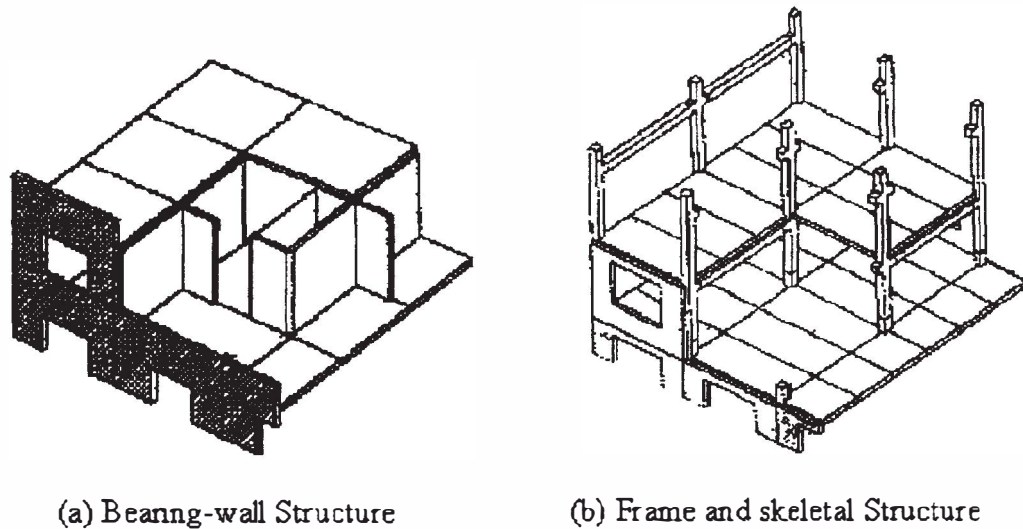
Precast Structure Systems (Bohdan, 1966)
